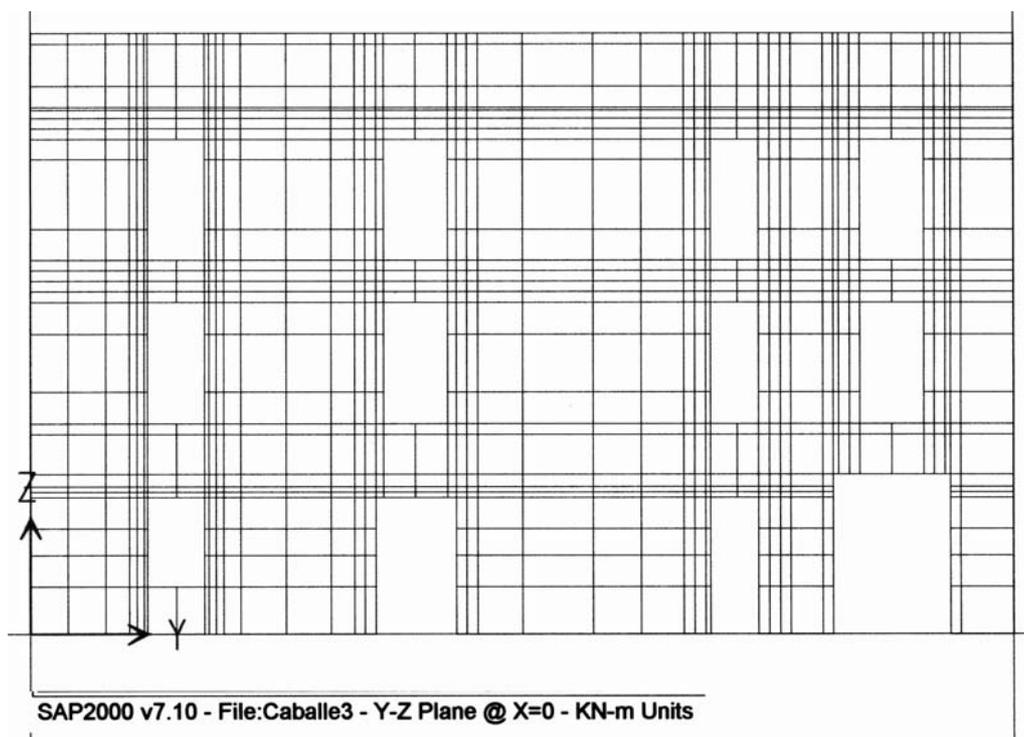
Model of façade. Caballerizas st. 10-12 (Seville)
